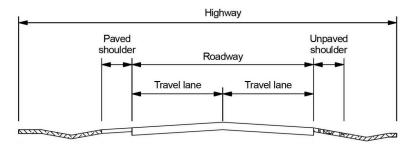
Roadway and shoulders (Shanteau, 2013)
